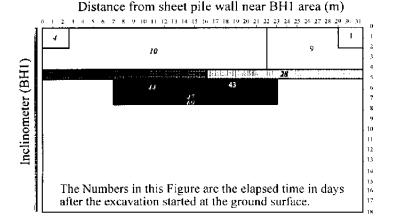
Excavation process at BH1 area(Section A-A' in Figure 5)
